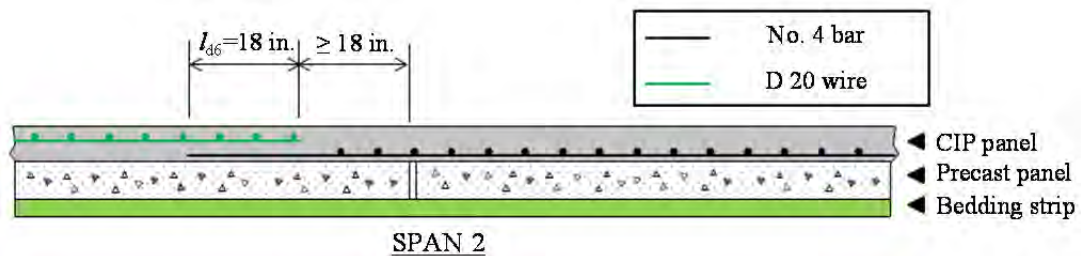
Details of longitudinal splices, Lampasas River Bridge (Section F-F)
